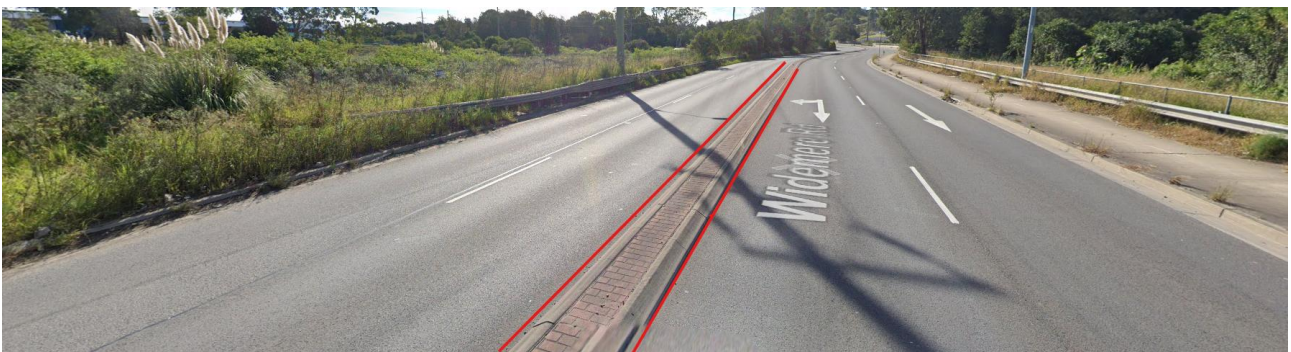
Median Island at Widemere Road (North of the intersection of Davis Road and Widemere Road).
